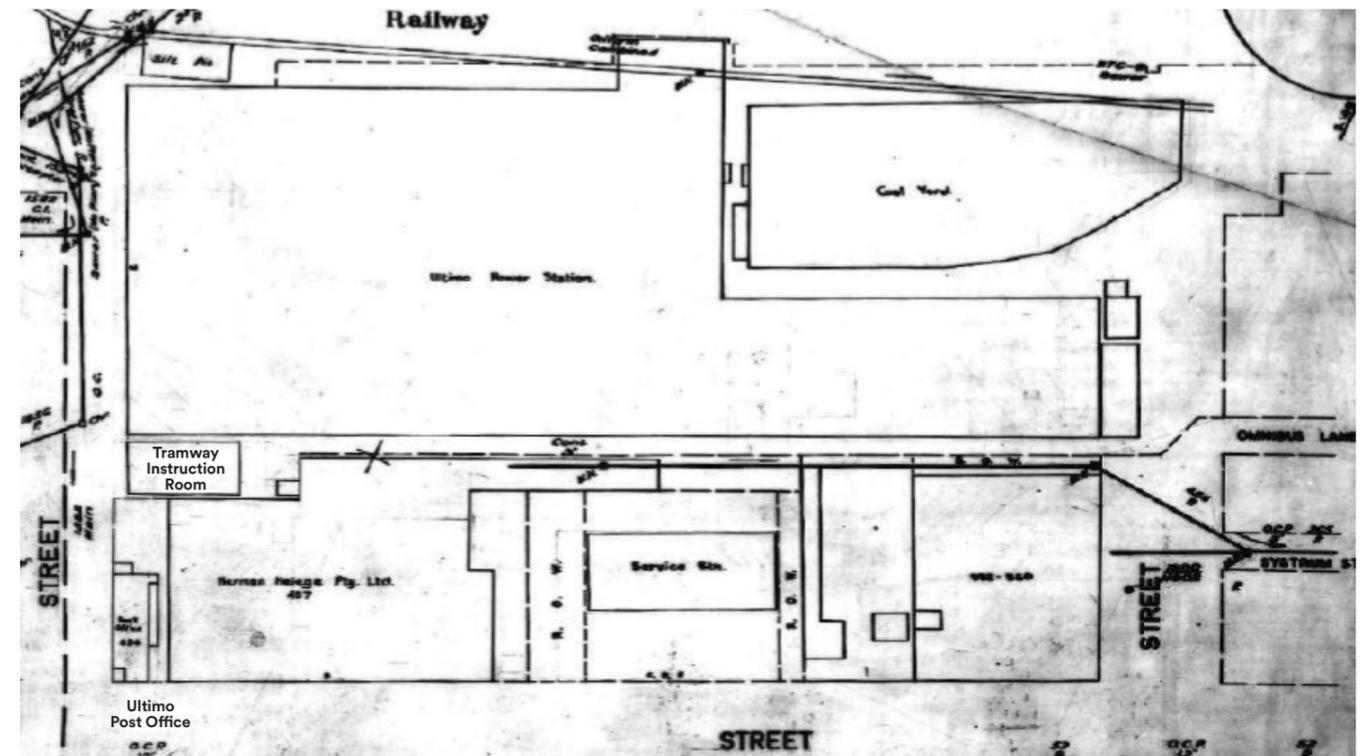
1963 plan of structures fronting Harris Street and Tramway Instruction Room along William Henry St (Source: Sydney Water DS3725 (2))
